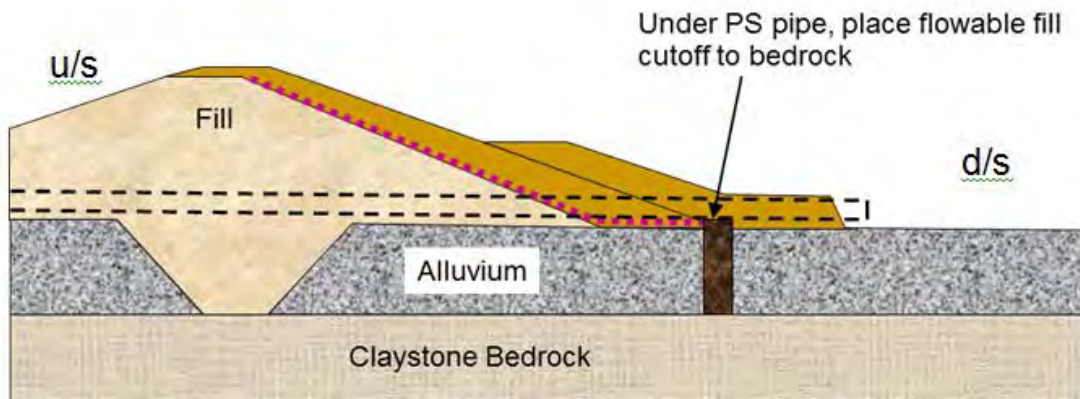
Principal spillway conduit detail, Olmitos-Garcias No. 2 Dam. Geotextile (dashed, pink line) is tied into a flowable fill cutoff under pipe.
